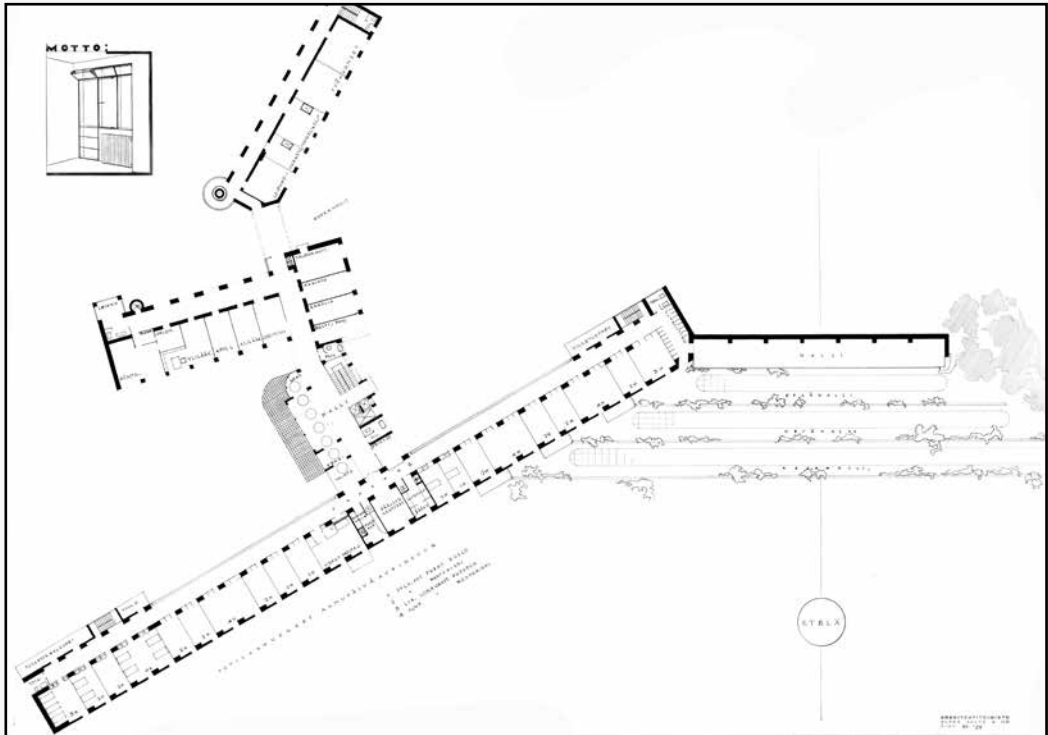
Main building ground floor plan of the competition-stage design. Drawing No. 50-25. The drawing has been edited. AAM.
